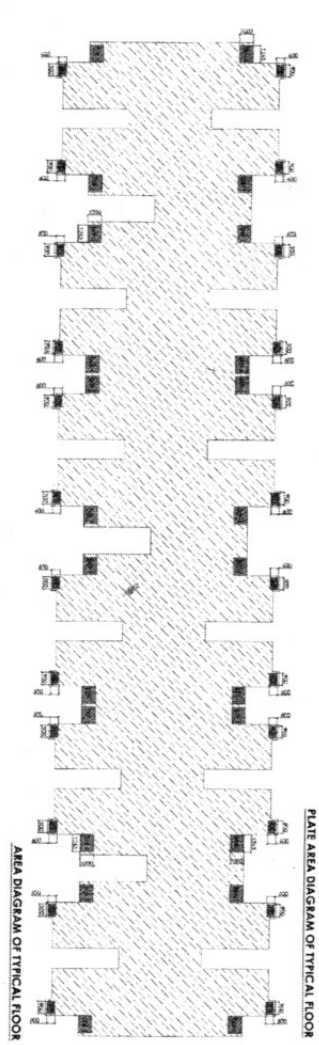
PLATE AREA DIAGRAM OF TYPICAL FLOOR
